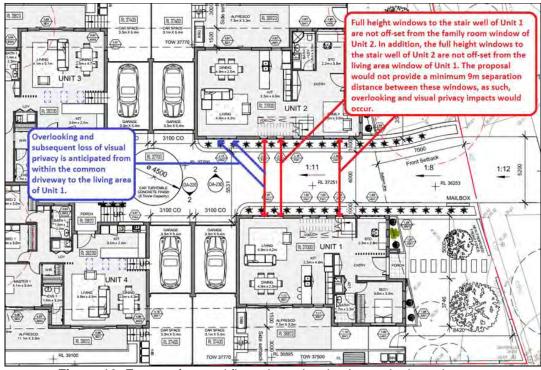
Extract of ground floor plans showing internal privacy impacts Source: Architectural plans
